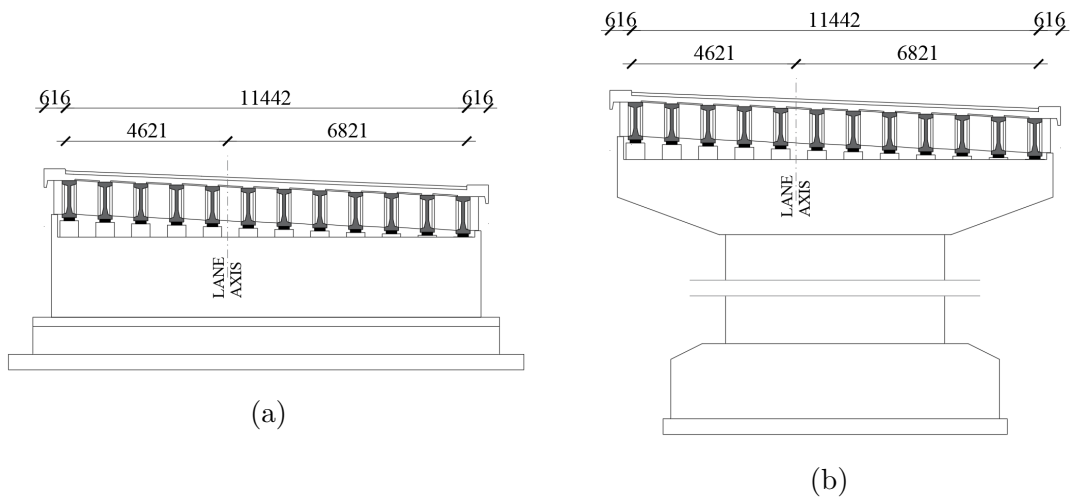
Cross-sections of the bridge: (a) A-A' section (b) B-B' section
